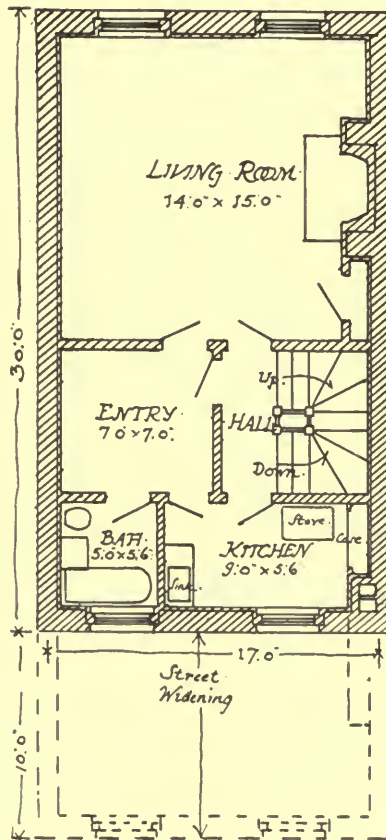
SINGLE HOUSE ALTERATION INTO SMALL KITCHENETTE APARTMENT, BEACON HILL, BOSTON.
